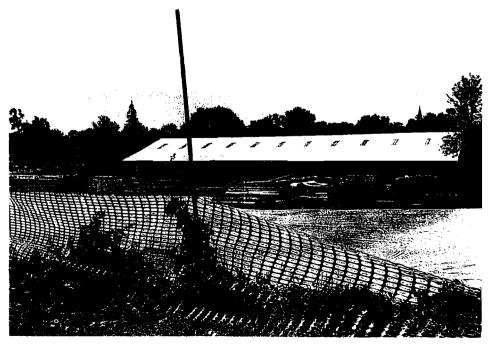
Facing southeast, Oneida MGP project area above surrounding terrain to southeast.
